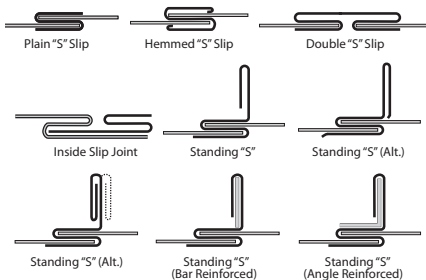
Breakaway Style Joints VARIATIONS TO TRADITIONAL BREAKAWAY STYLE TRANSVERSE JOINTS
